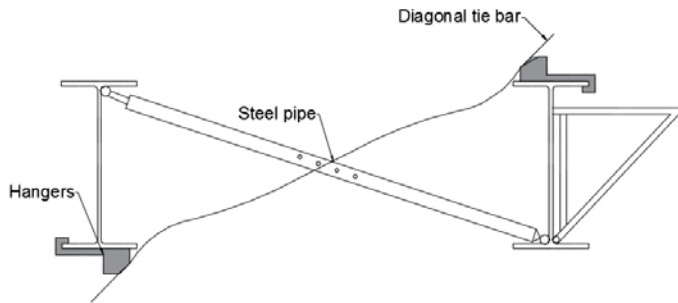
Cross section with transverse tie + horizontal pipe (UDT + HP).
